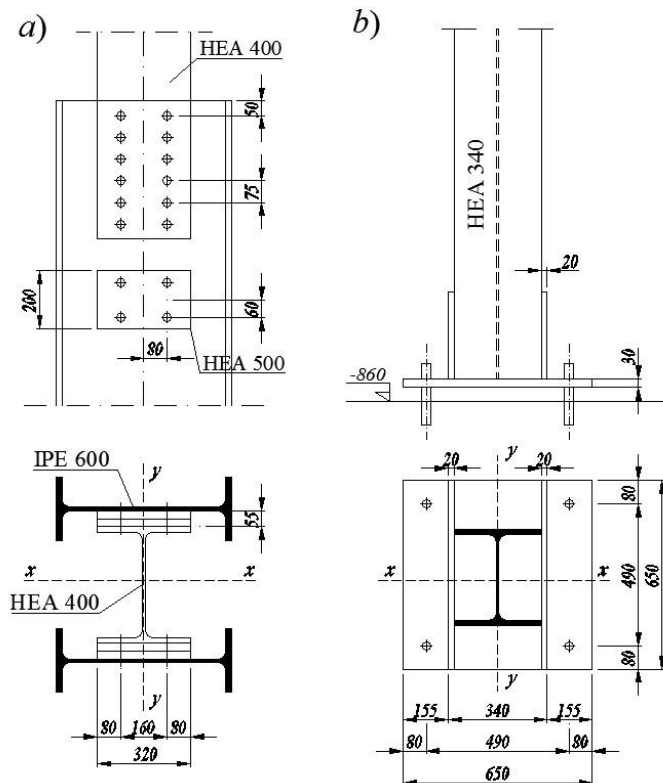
(a) details at the top of type B columns; (b) columns and base connections of type C columns.
